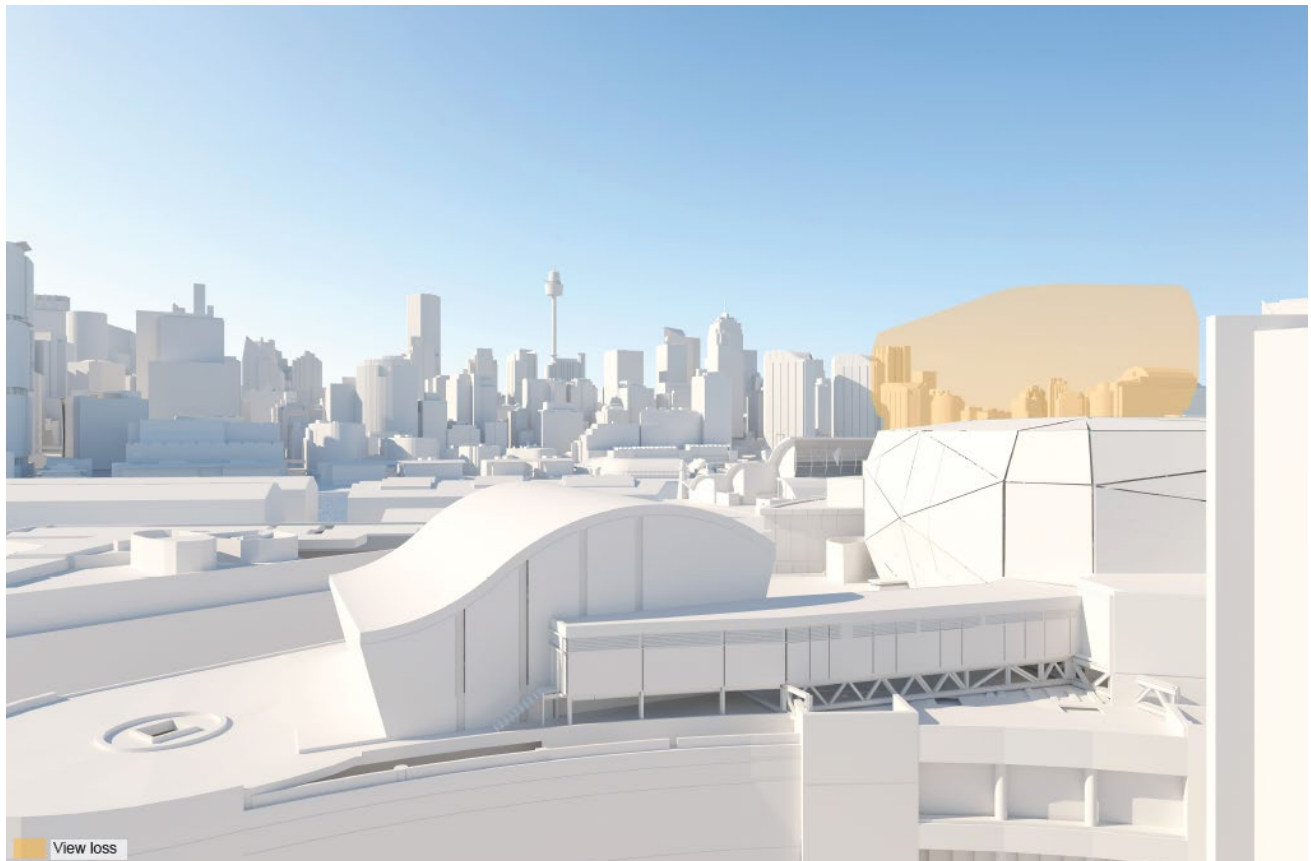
CAM14: Watermark Pavilion, central section, 8th storey, area of impact
